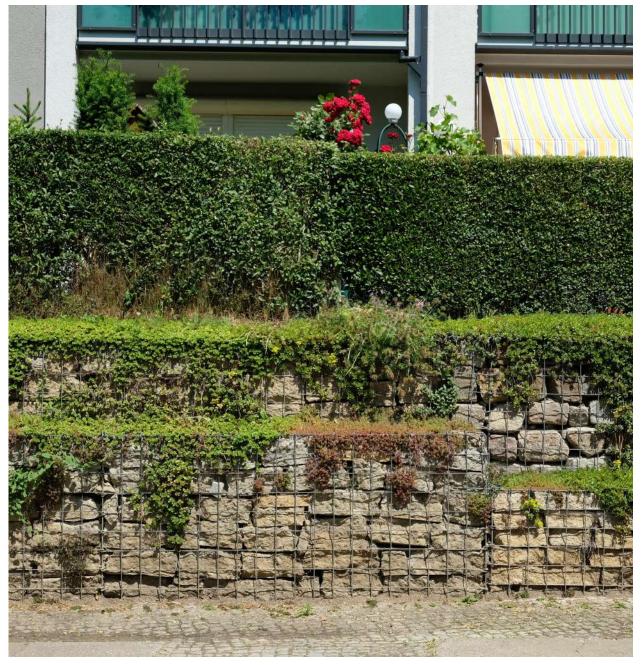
Planted stone gabions constructed using rubble from a demolished building in Berlin, Germany.
